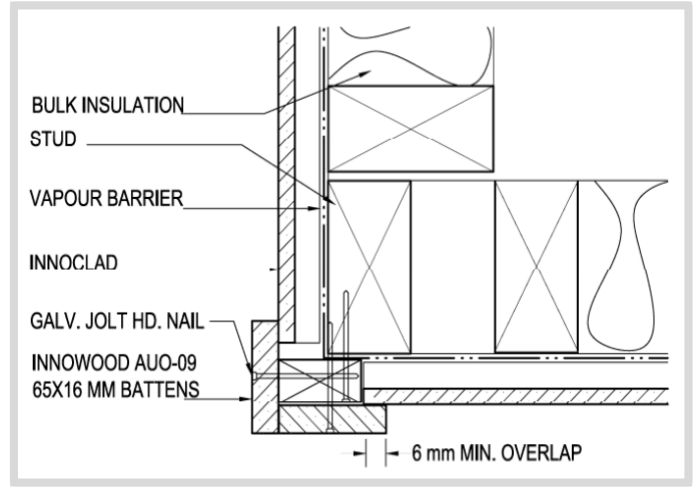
; Typical Detail - Timber Ground Floor Level.
